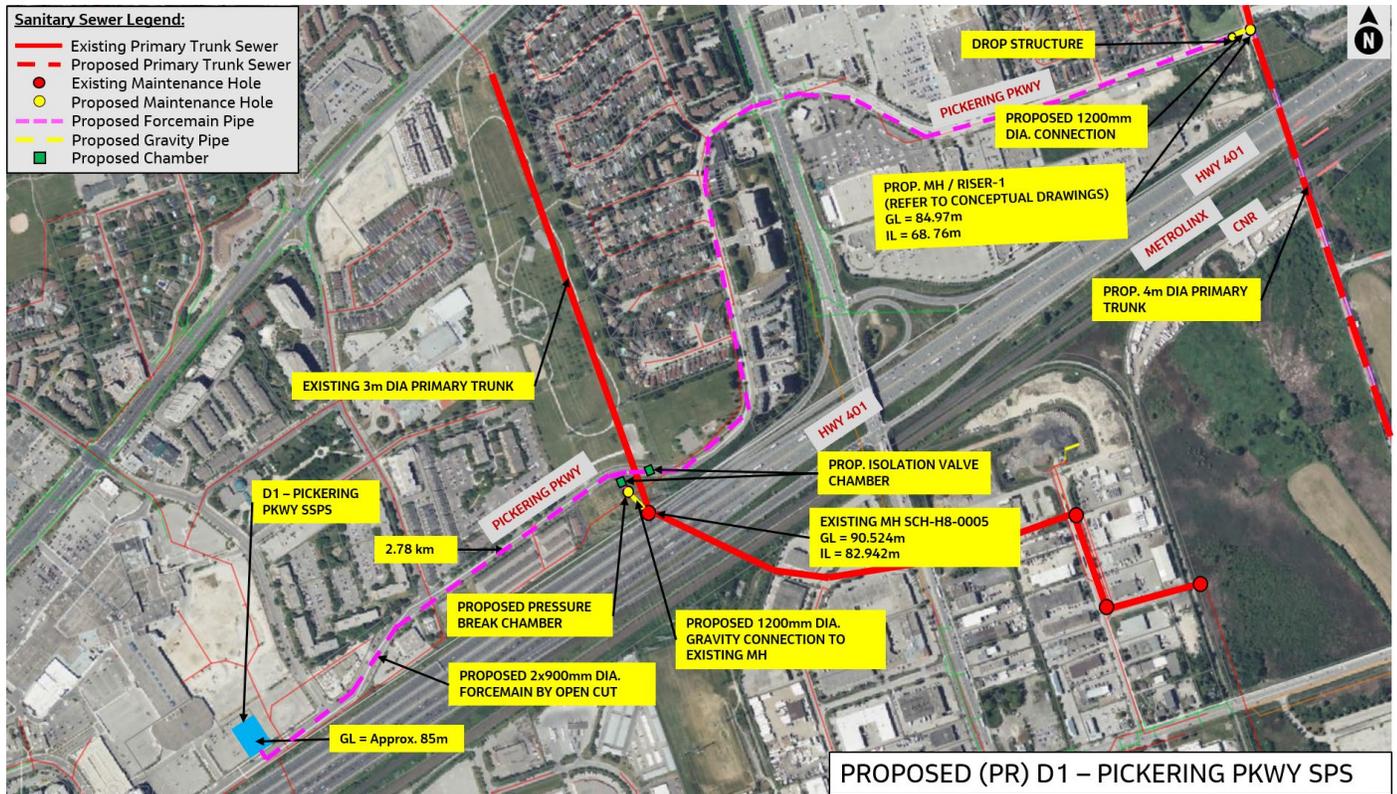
Connection of Pickering Parkway SPS to the Existing and Proposed Primary Trunks
